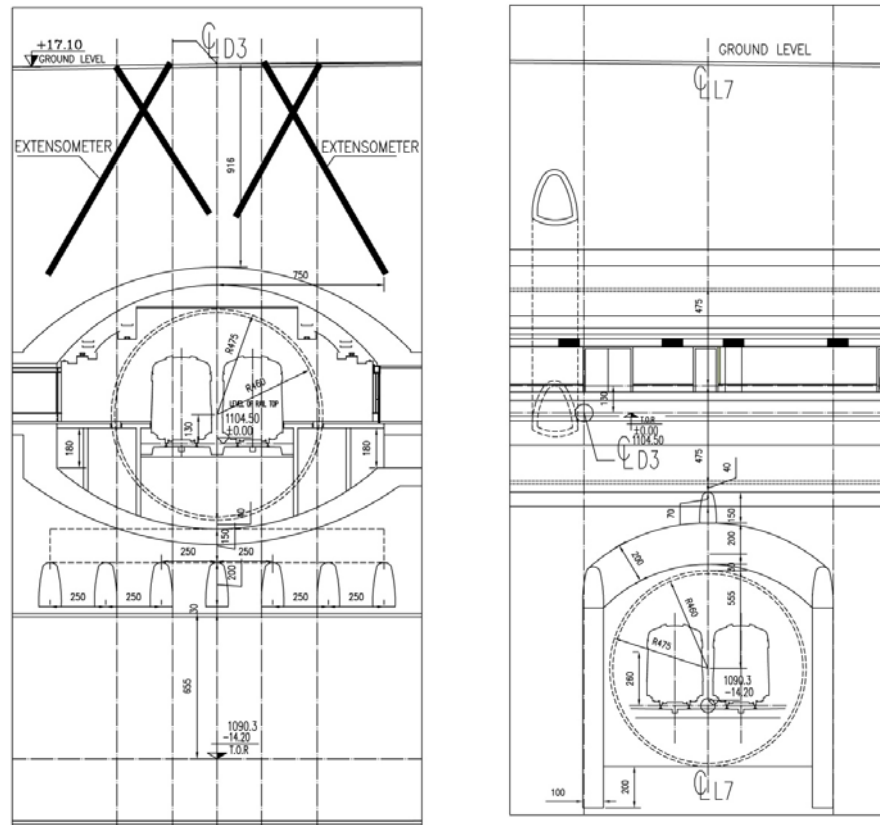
Sections of D3 station and L7 tunnel showing installed extensometers.
